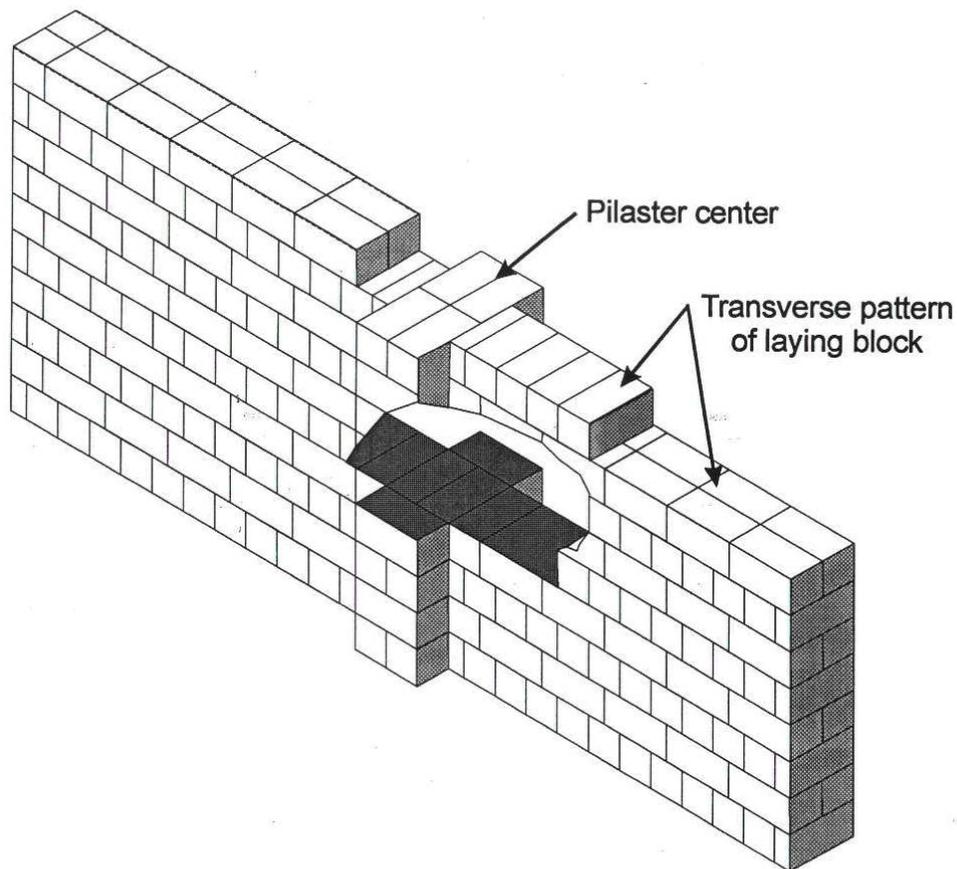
General Schematic of Concrete Block Stopping with Pilaster (Schematic shown does not include a door and is not to scale)
